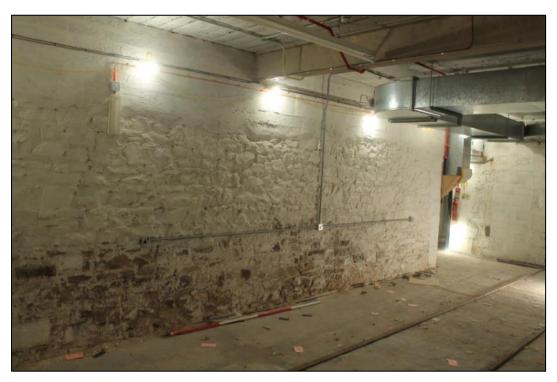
View west, showing the steel door at the west end of the cross corridor. 2m and 0.5m scales.
